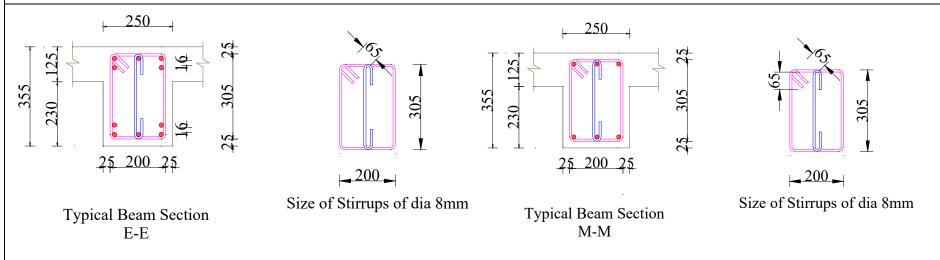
REINFORCEMENT DISTRIBUTION IN FLOOR BEAM OF TWO STOREY BUILDING
